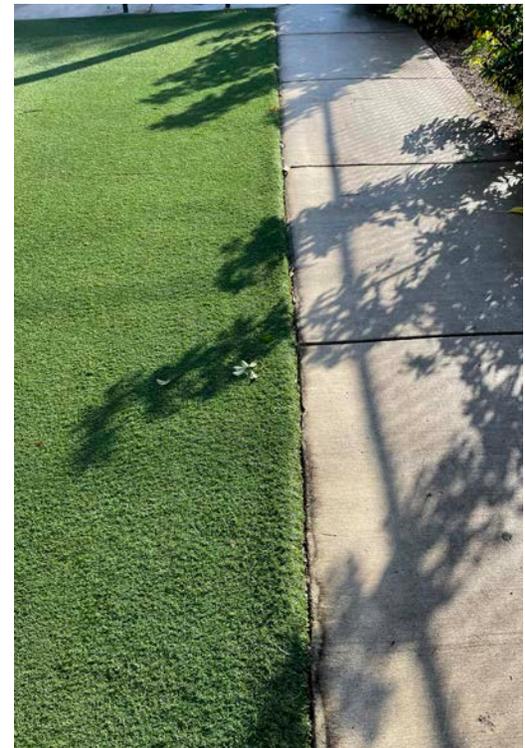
ERNESTINE JACKSON SEYMORE PARK EXISTING SITE PHOTOS
